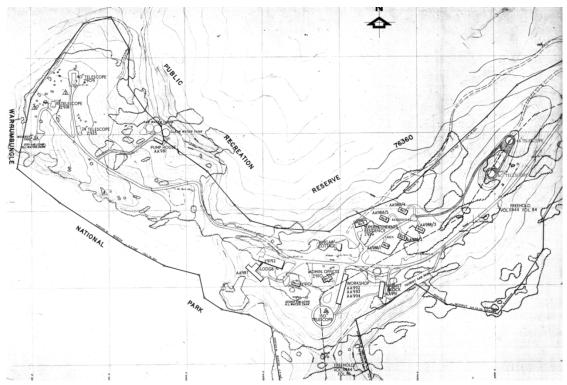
A 'General site plan' dating to February 1969, showing existing and proposed buildings at this date (ANU plan 69/S/025B).
